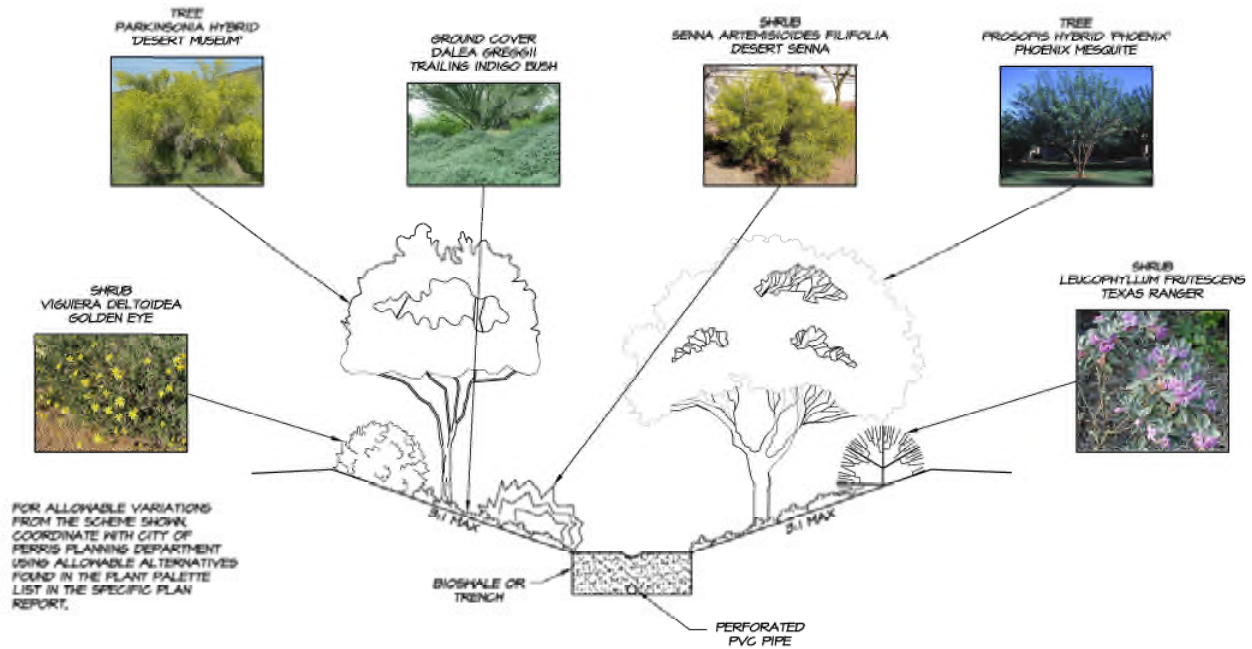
VEGETATION SELECTION AND APPROXIMATE PLACEMENT WITH PLANTABLE WALL
